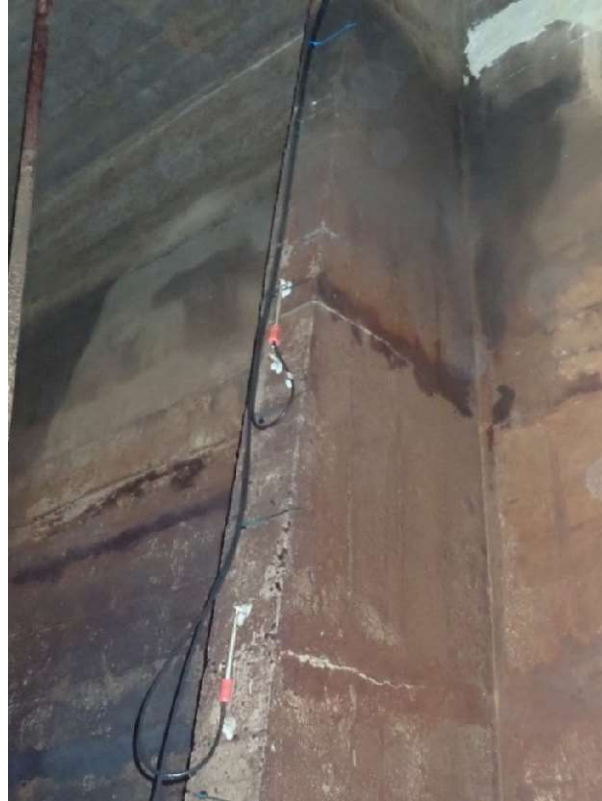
Strain gauge installations across two new horizontal cracks extending partly through an internal wall counterfort.
